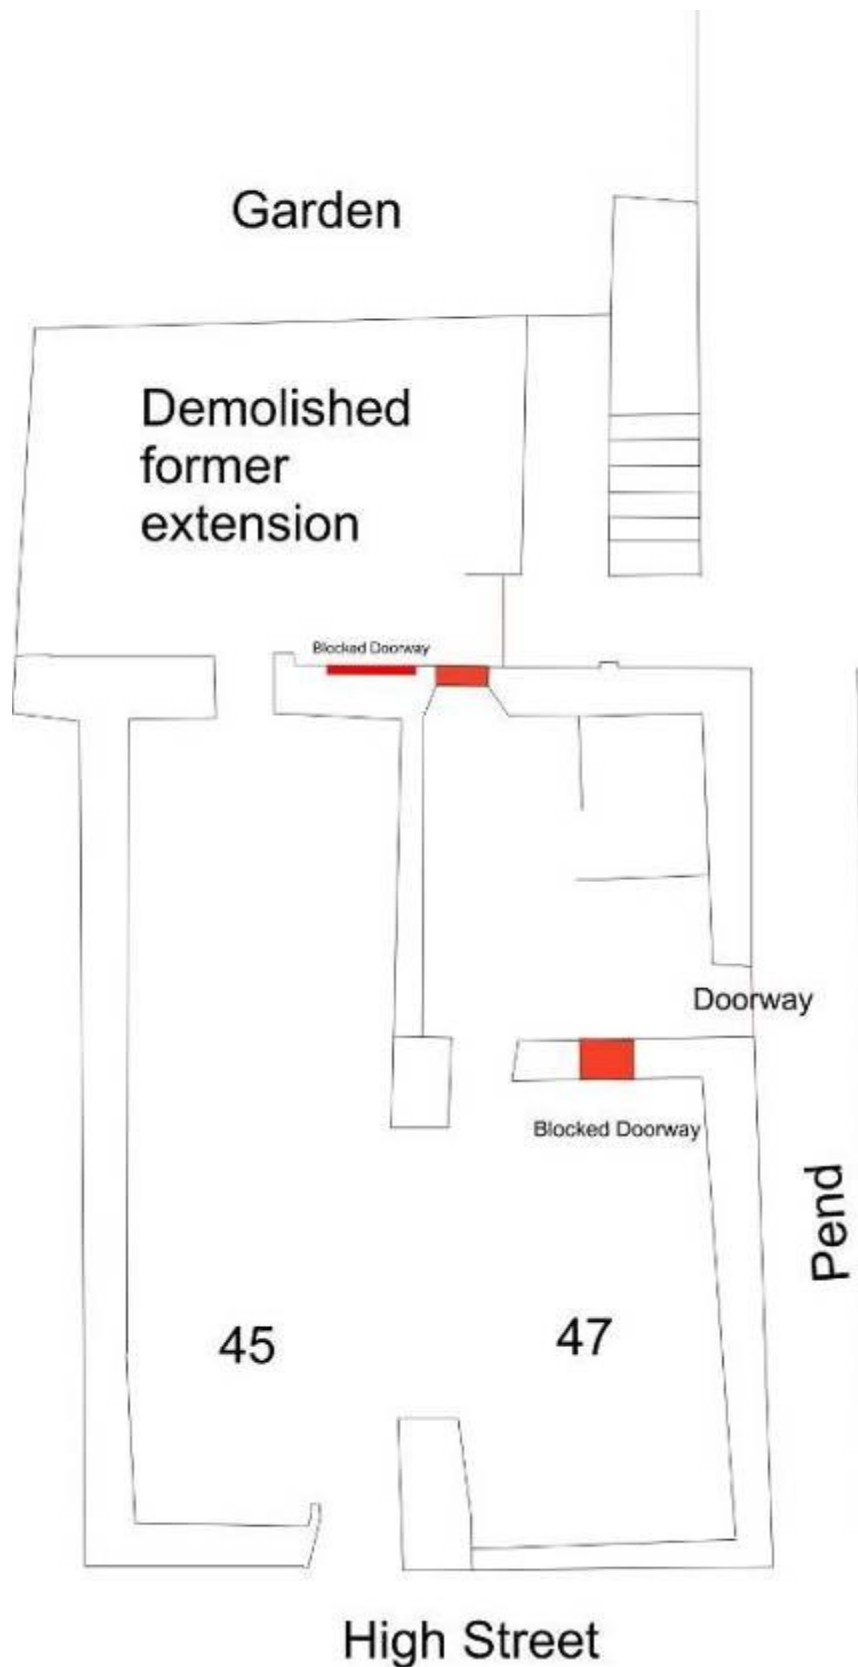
Ground floor of 45 and 47 High Street showing further blocked doorway and plan of building following demolition of external extension Scale 1:50
